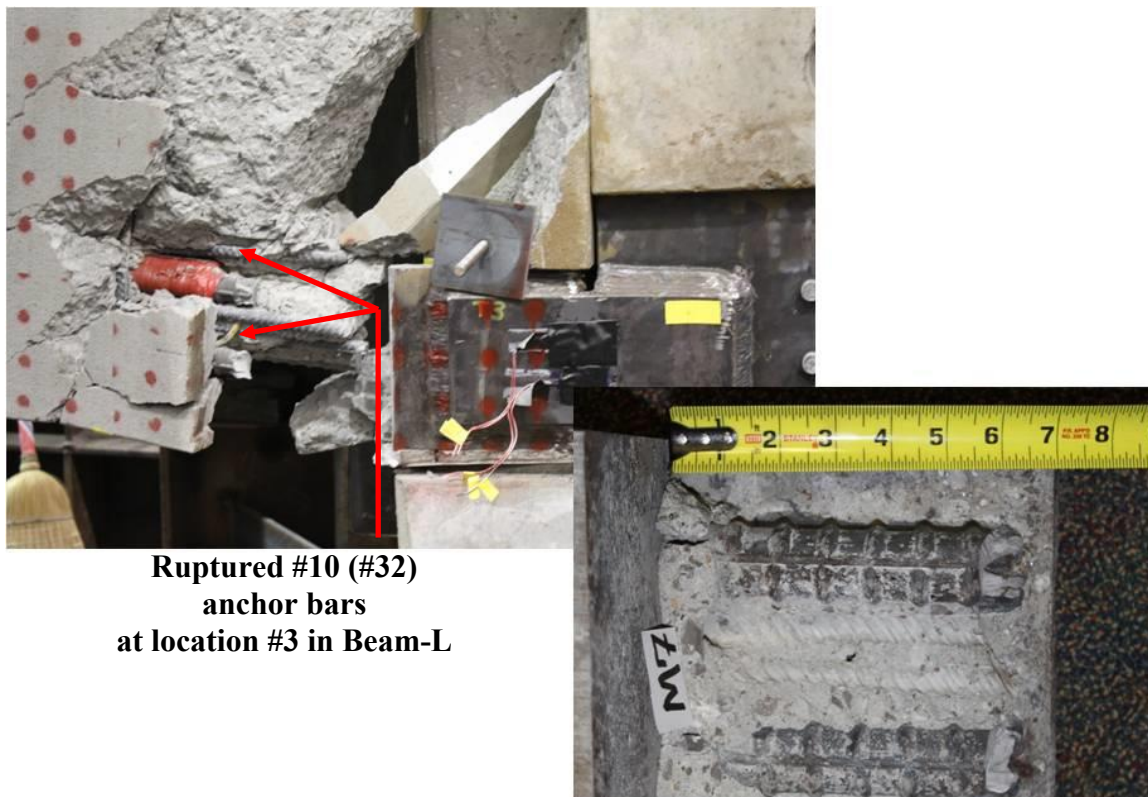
Fractured anchor bars of M7 angle plate in Beam-L (elevation view)
